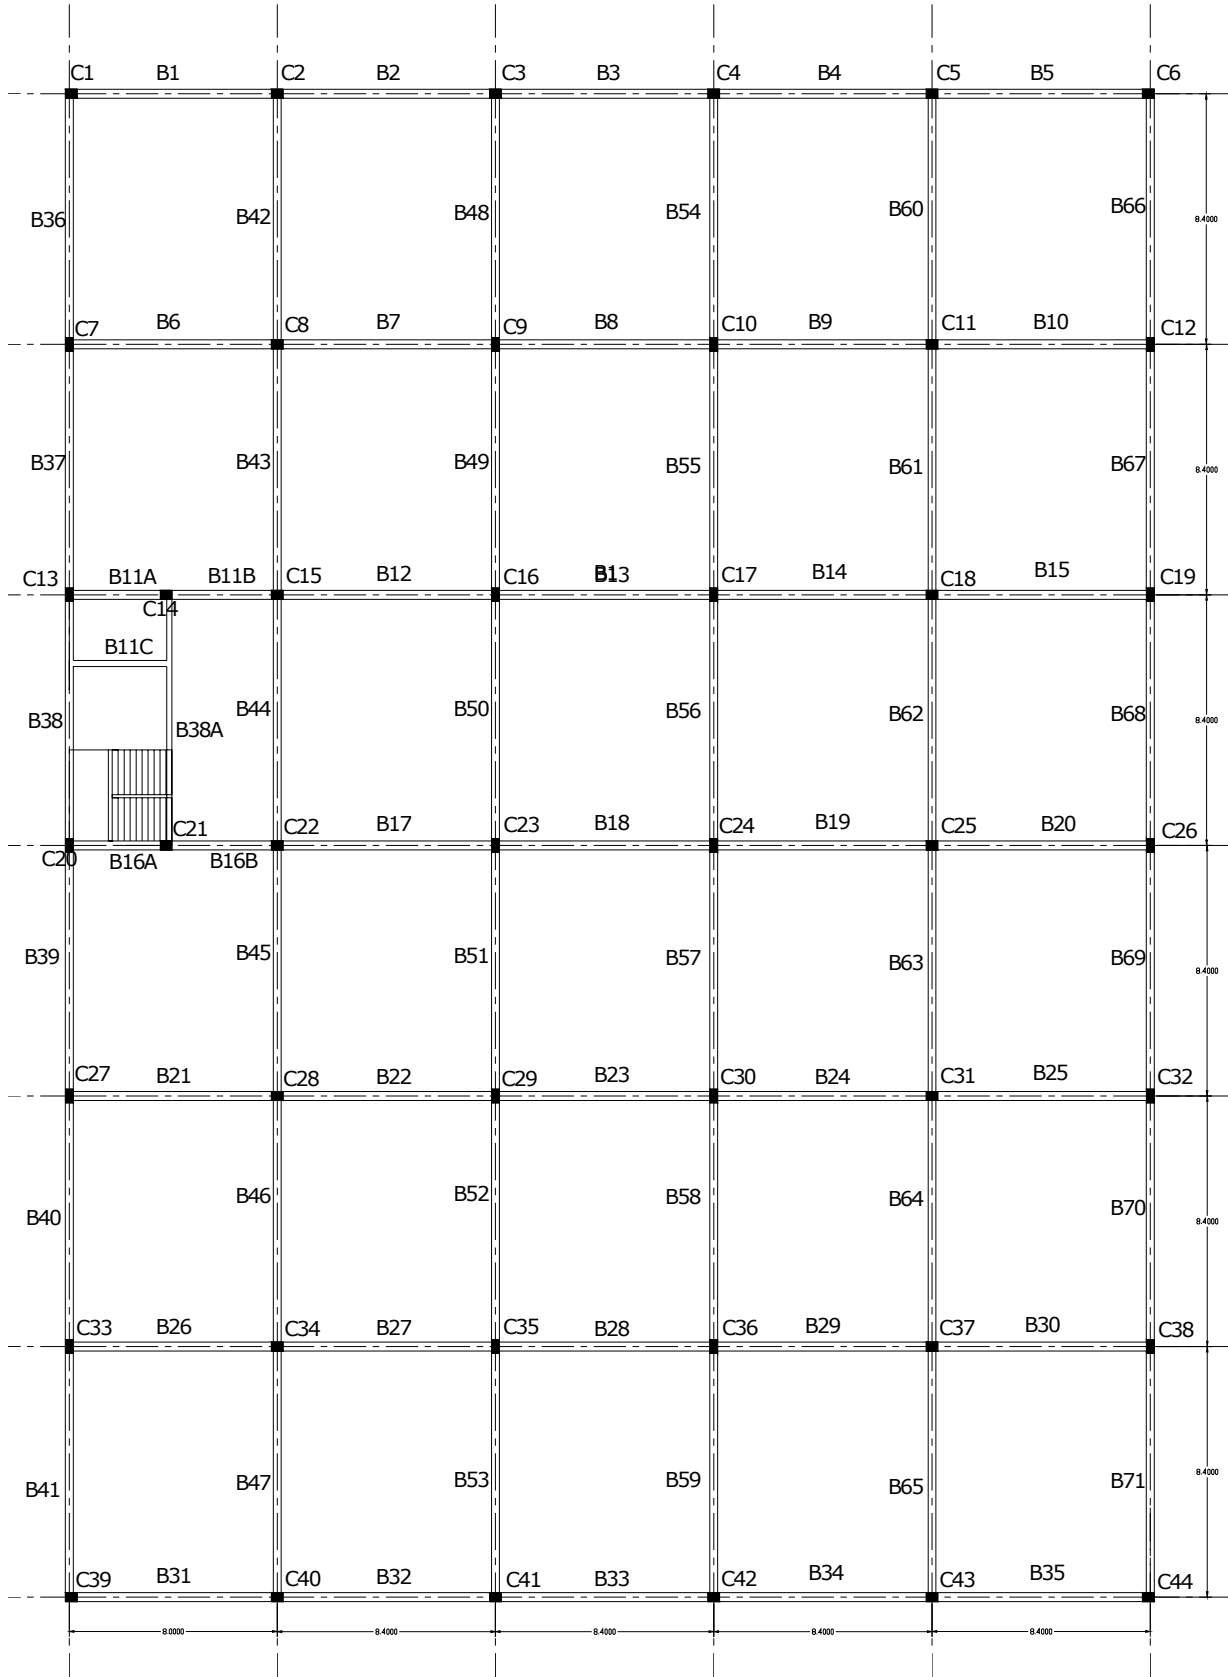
Floor system for post-tensioned slab with RCC beams
